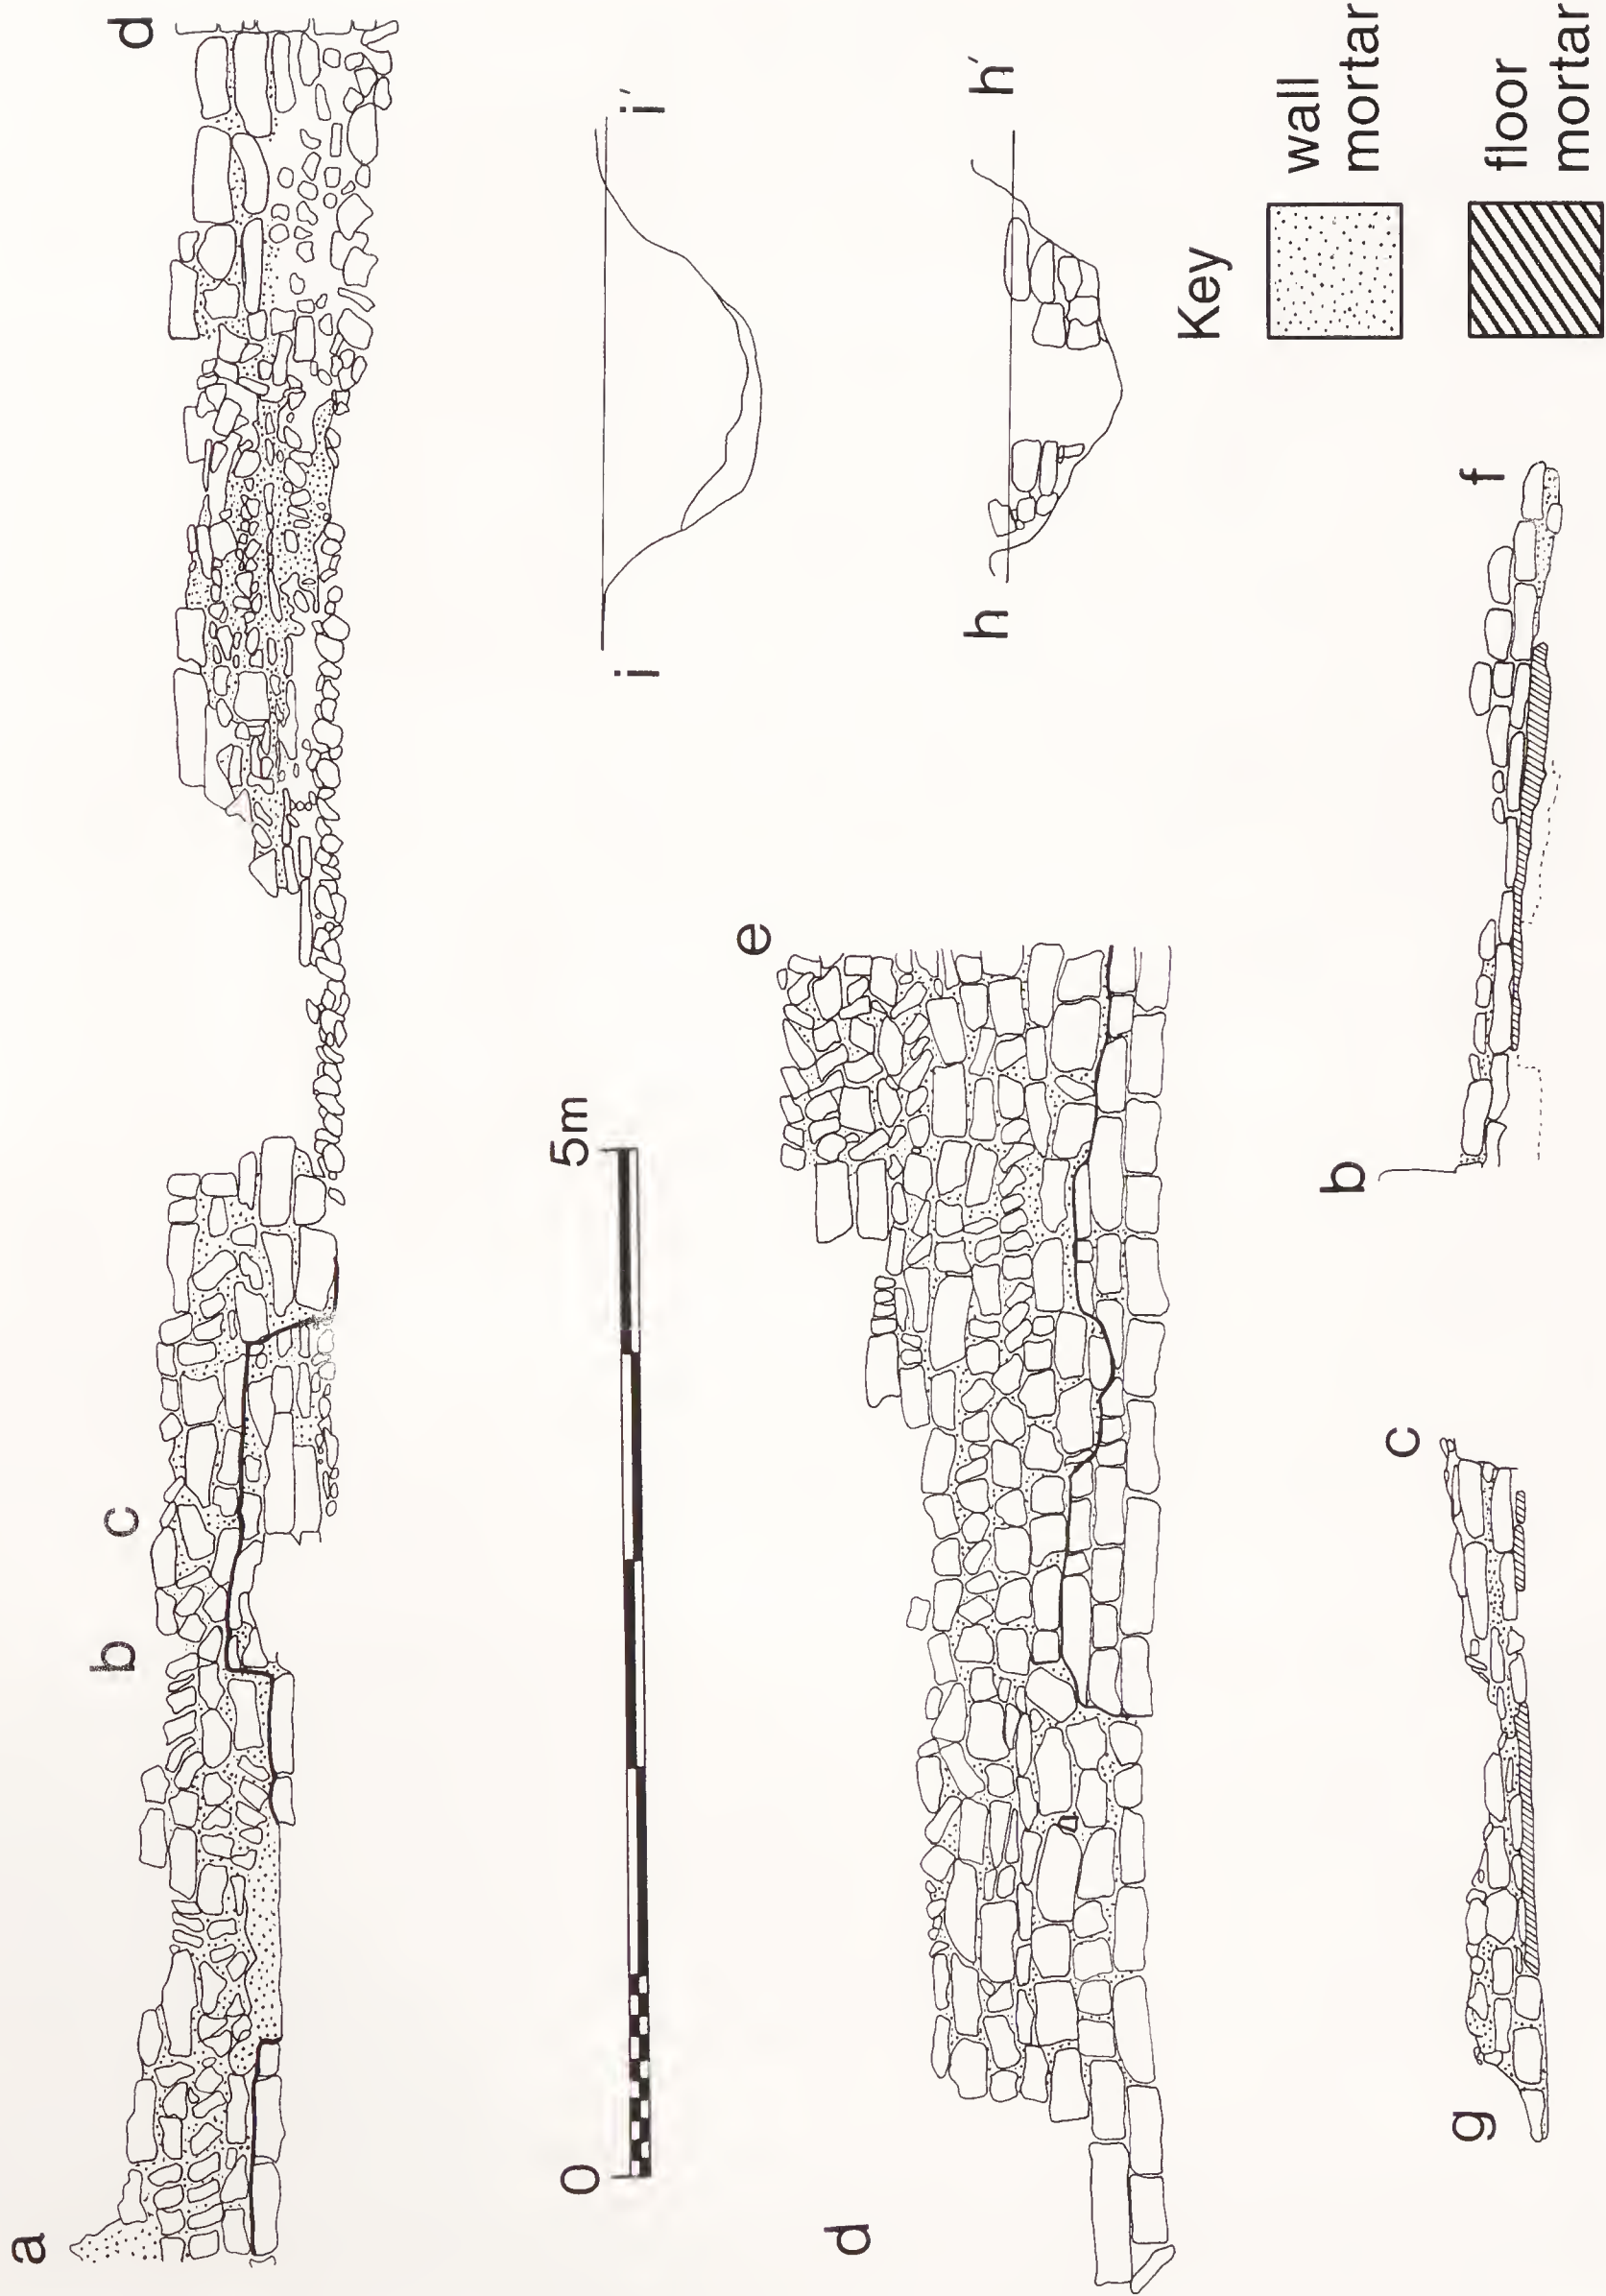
Elevations of walls; position of elevations shown on Figure 1. Sections through intrusion B; position of sections shown on Figure 2.
